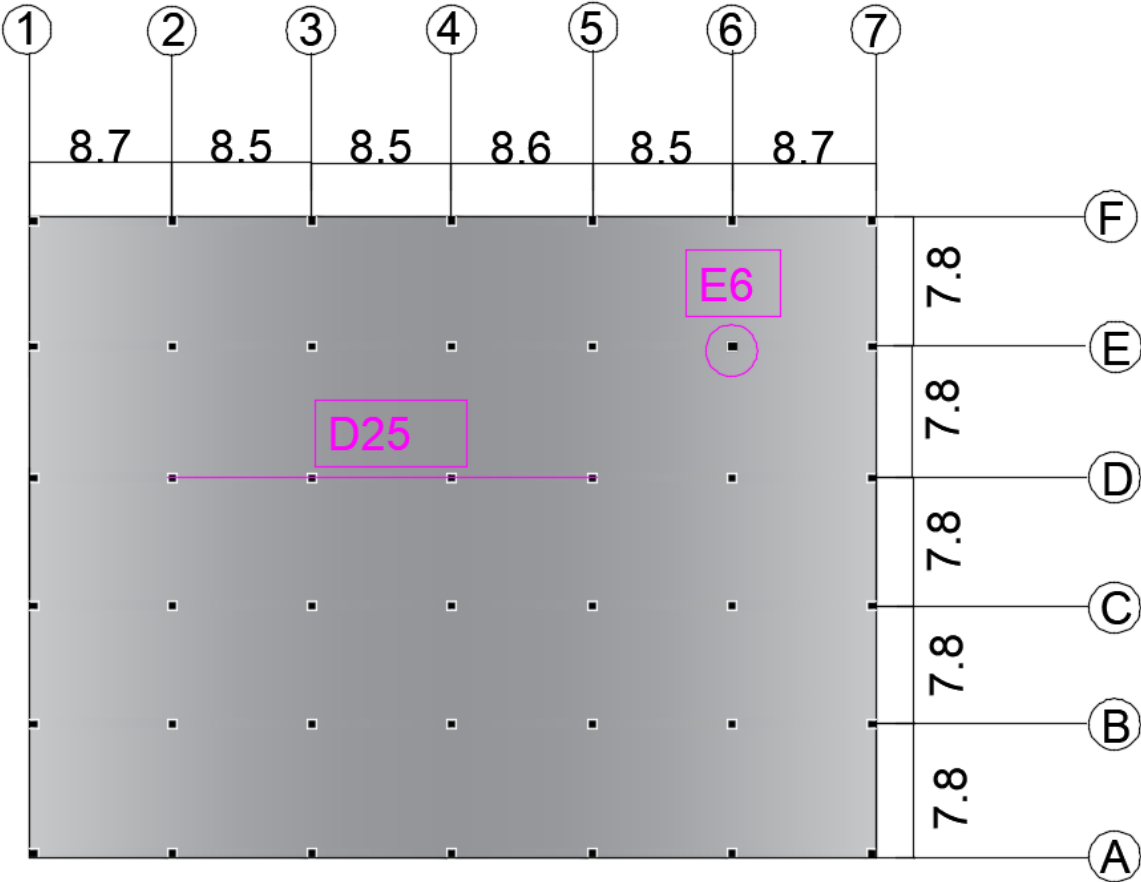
sketch of the revised design of parking house based on recommendations. Executed in AutoCAD
